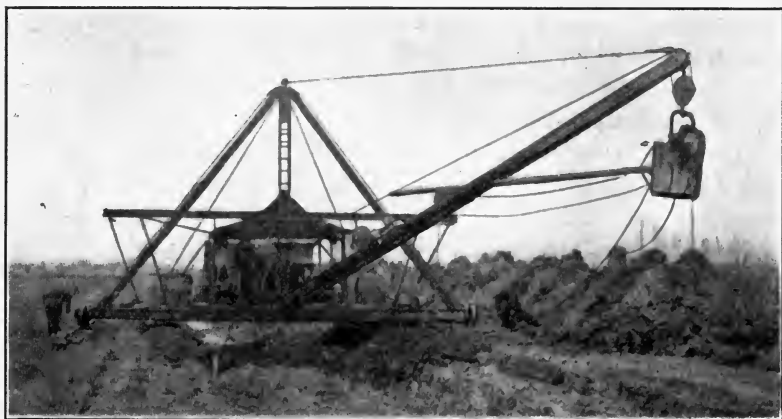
Land dredge excavating small drainage ditch. (*Bay City Dredge Works.*)
